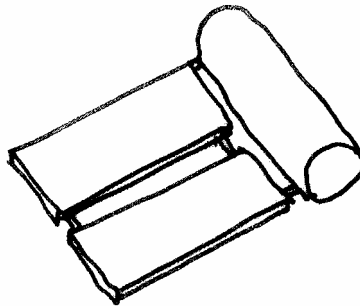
Prefabricated pipe lagging installed on existing pipe
